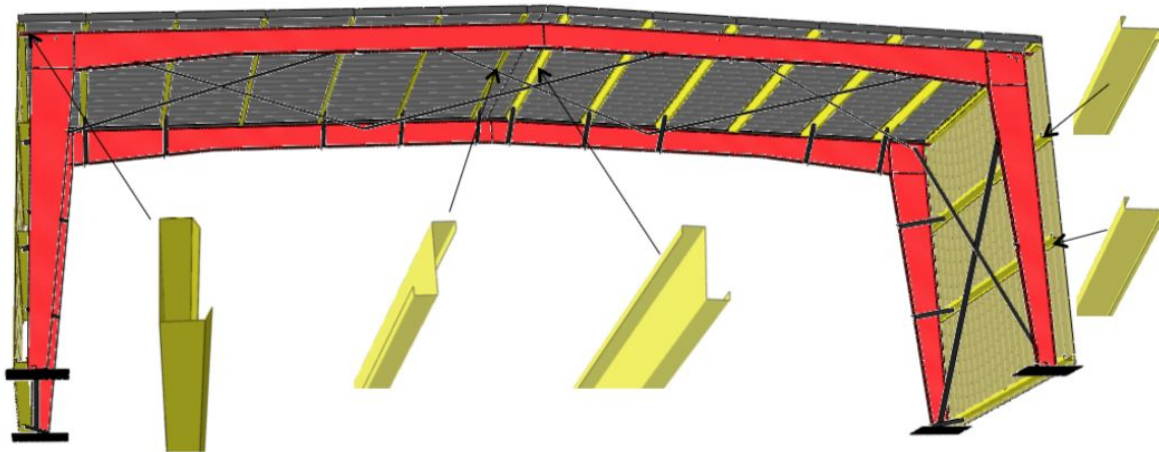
Girts, purlins and eave strut are modeled as shell elements
